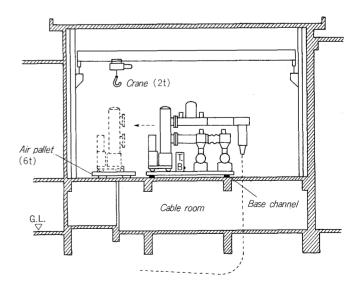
Sectional view of 132 kV SF<sub>6</sub> gas insulated switchgears room
